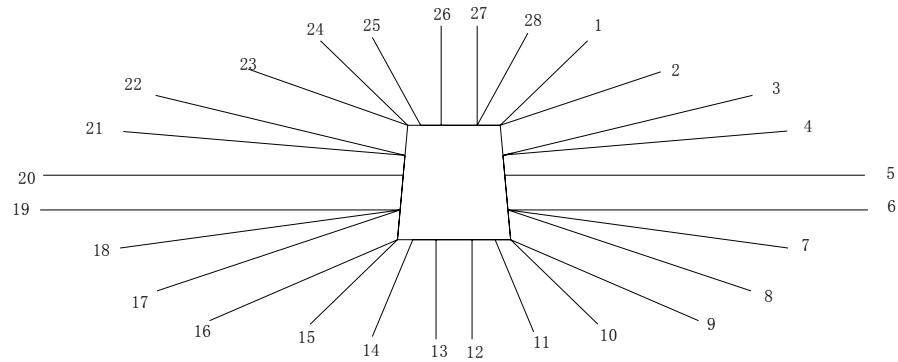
Cross-section of sealing adits and inclined shaft with drainage.
